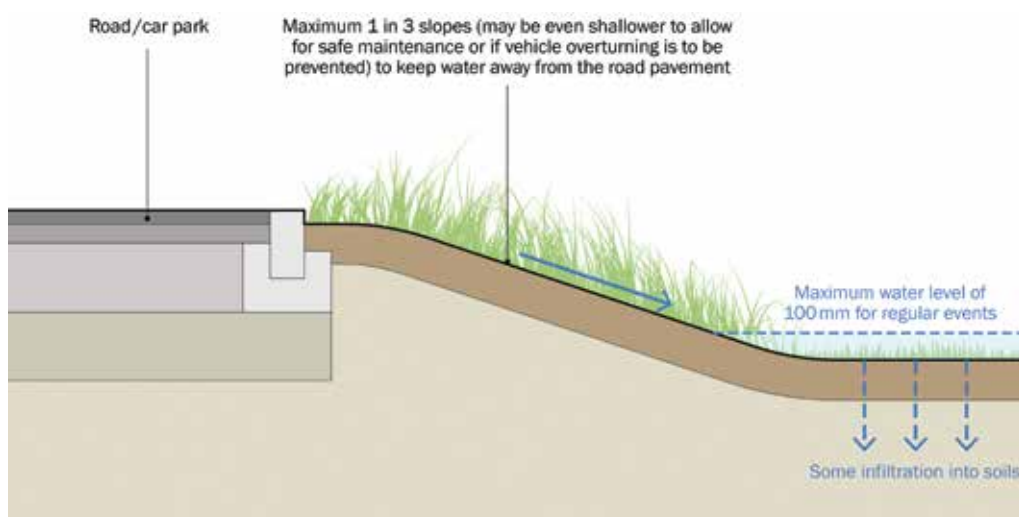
Water flows from shallow swales acting as edge drains for the road sub-base
